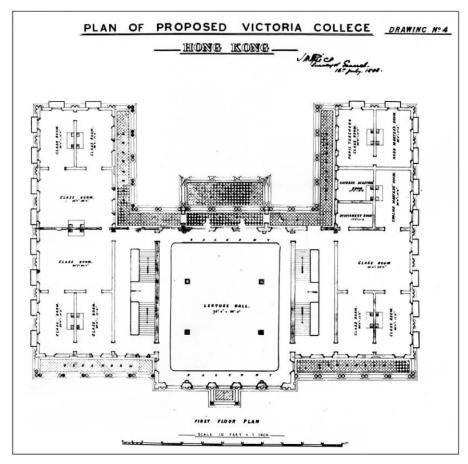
First floor plan of Victoria College (renamed as Queen's College in 1894) in 1889.
